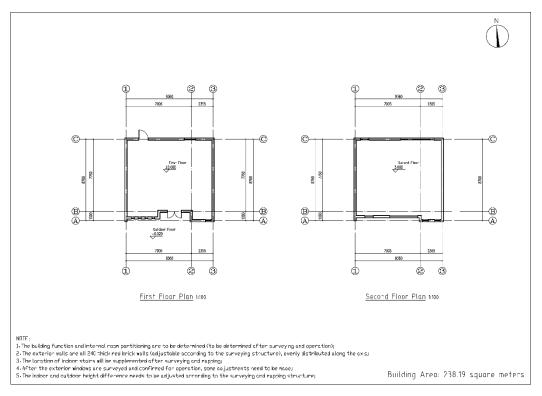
The First Floor Plan and Second Floor Plan of Sample Building No. 2 (Drawn by the author)
